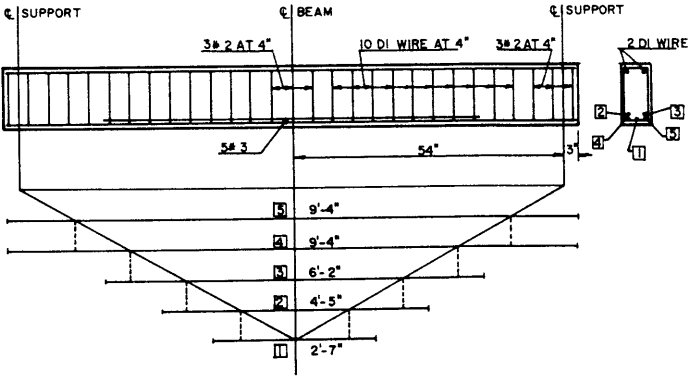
Reinforcement Arrangement in Spandrel Beam of Specimen B5 (1 in. = 25.4 mm)
